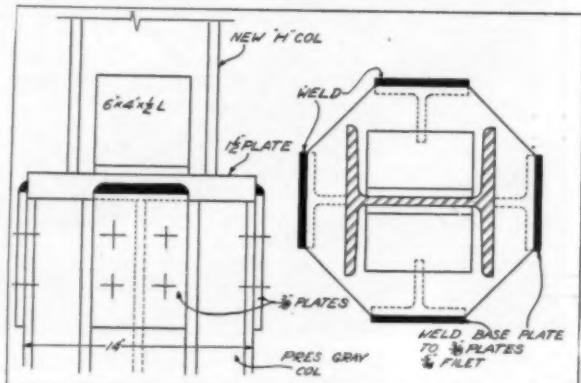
Welded Connections Between the Six-Story Columns and the New Steel for the Four Additional Stories
